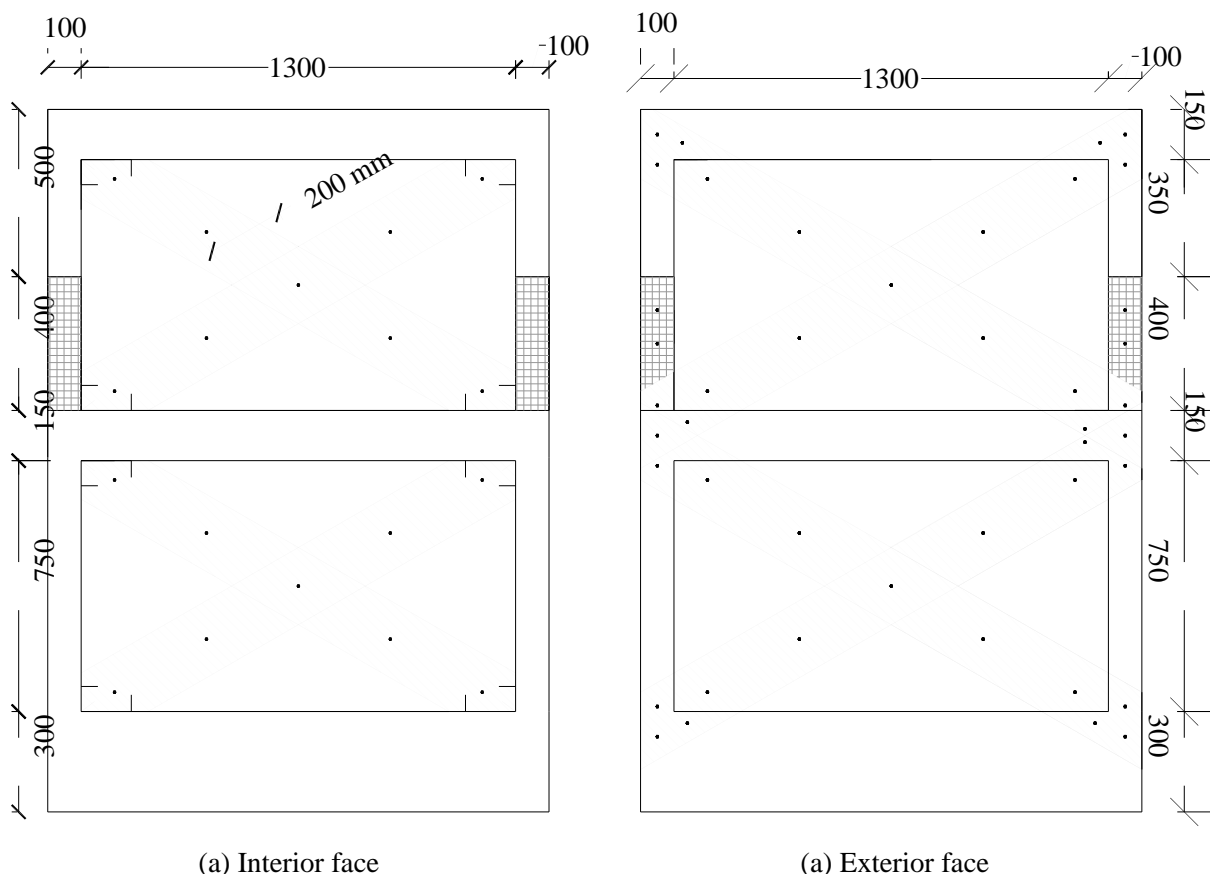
CFRP arrangement and location of the anchor dowels in Specimen SP-5 (dimensions are in mm)
